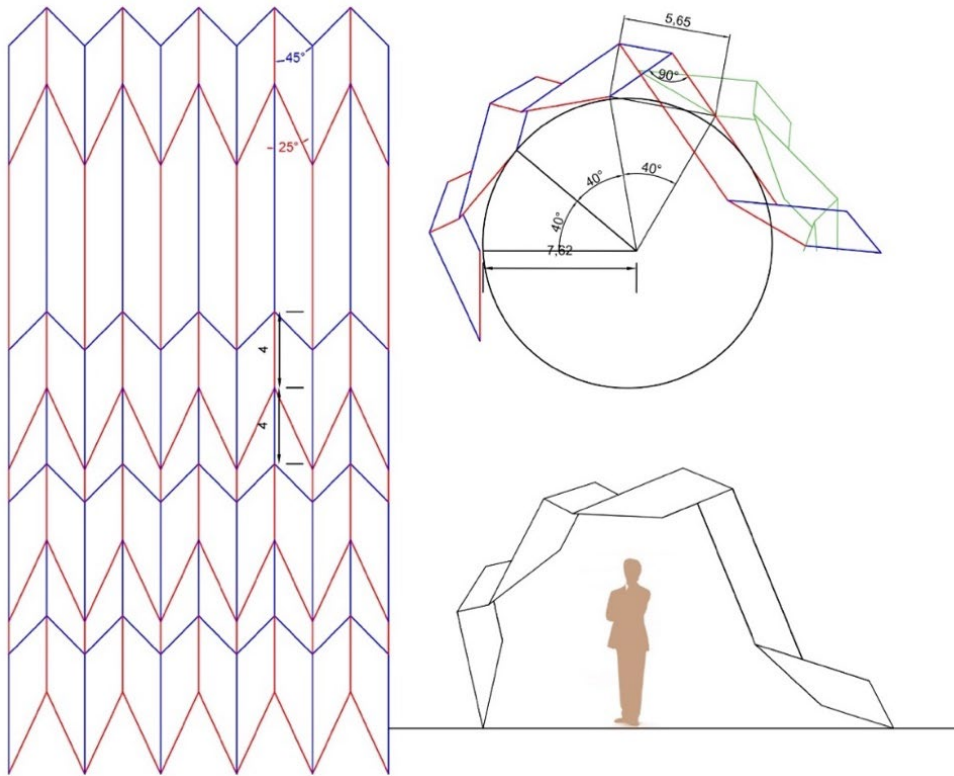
Plan and section drawings of the Exhibition Unit Design (Designed by Deniz Demir, 2020).
